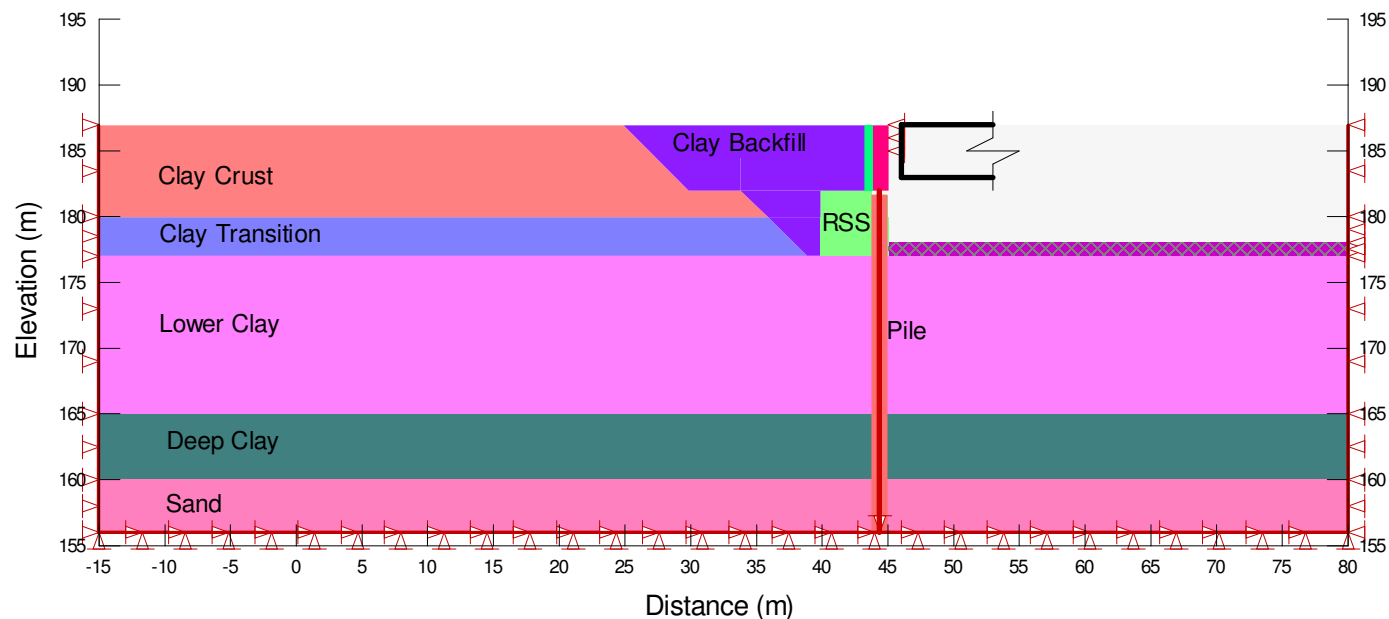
Global Stability (Long-term Loading) of North Abutment RSS Wall
